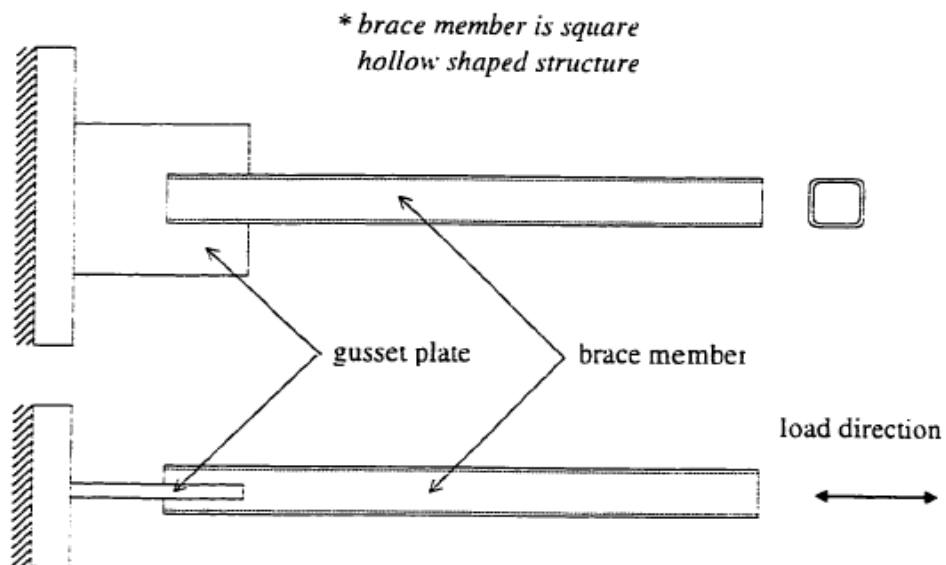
9 – A typical test specimen from Jain et al., 1987.
